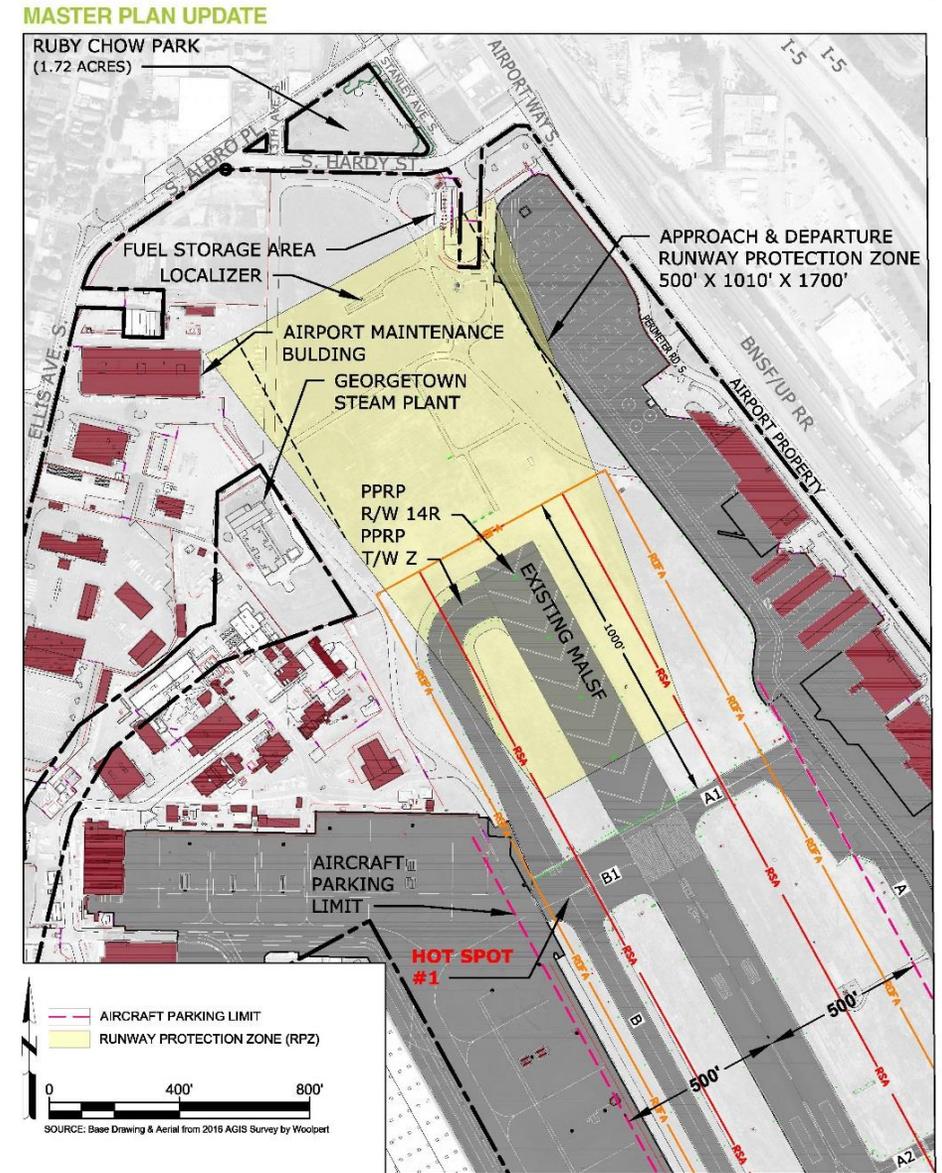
RUNWAY 14R INSTRUMENT APPROACH PROCEDURE/ RUNWAY PROTECTION ZONE DETAIL (Alternative Three)
